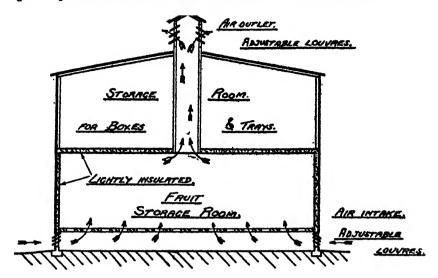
DIAGRAMMATIC CROSS-SECTION OF A TYPICAL "VENTILATED" FRUIT STORE, ILLUSTRATING THE PRINCIPLES INVOLVED IN THE VENTILATION SYSTEM.
